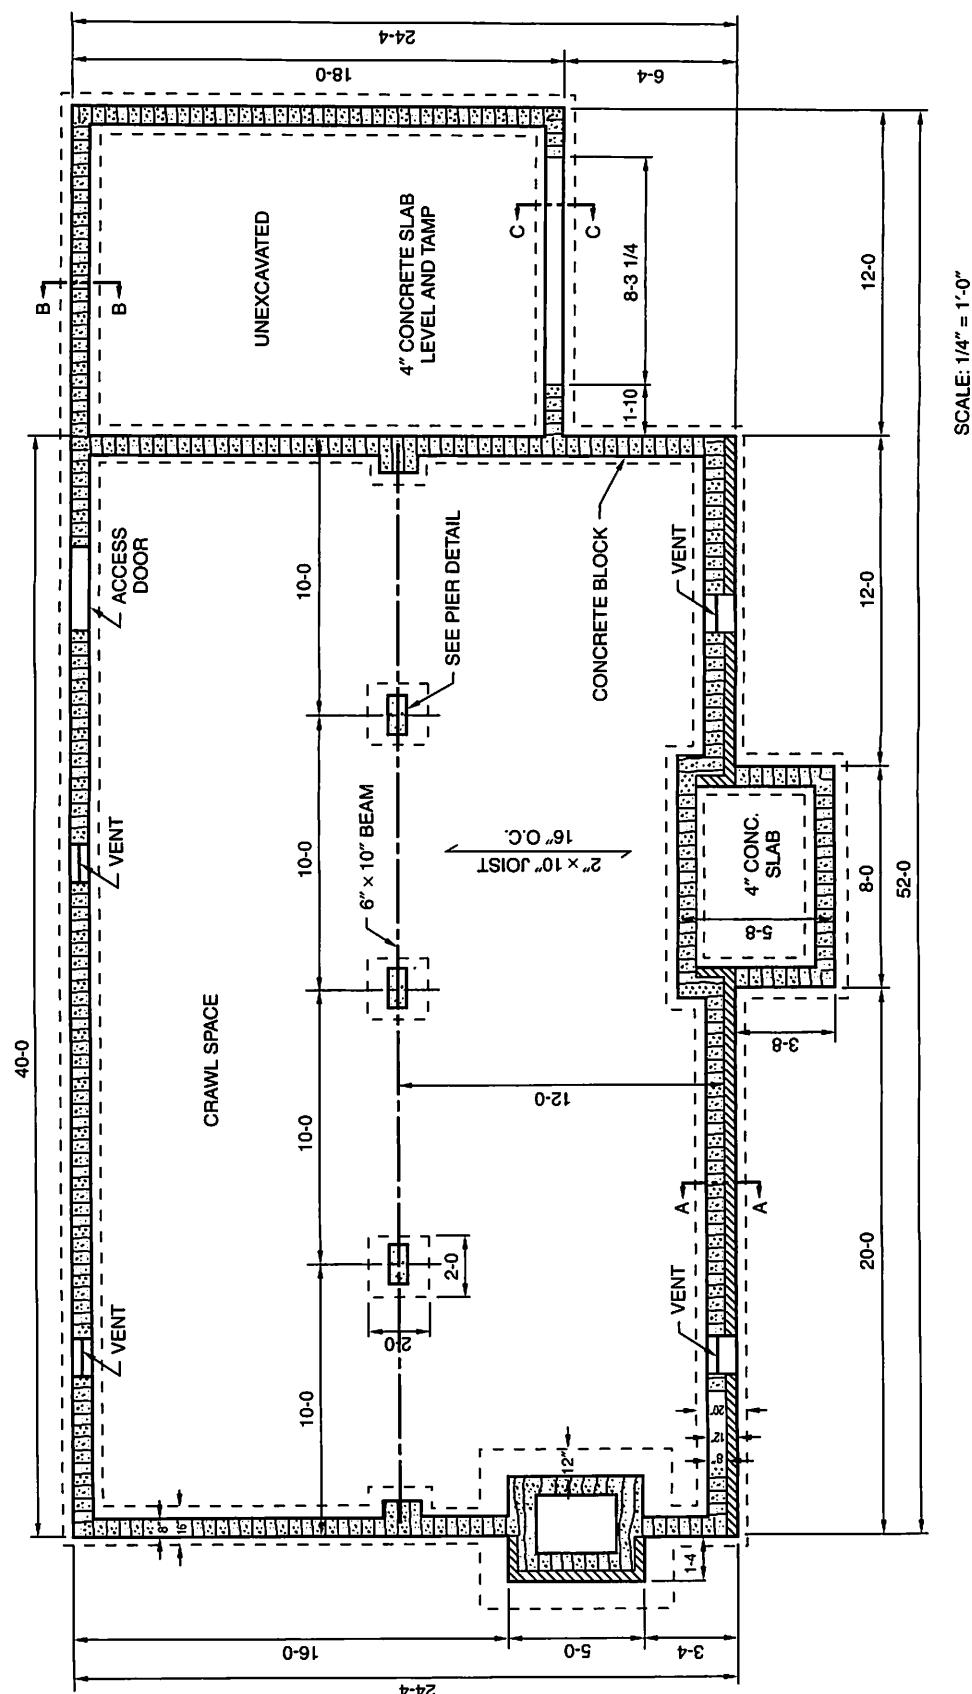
The completed foundation plan showing dimensions, notes, foundation material hatch pattern, and drawing scale. This house has a stud wall frame with a brick veneer along the front.
